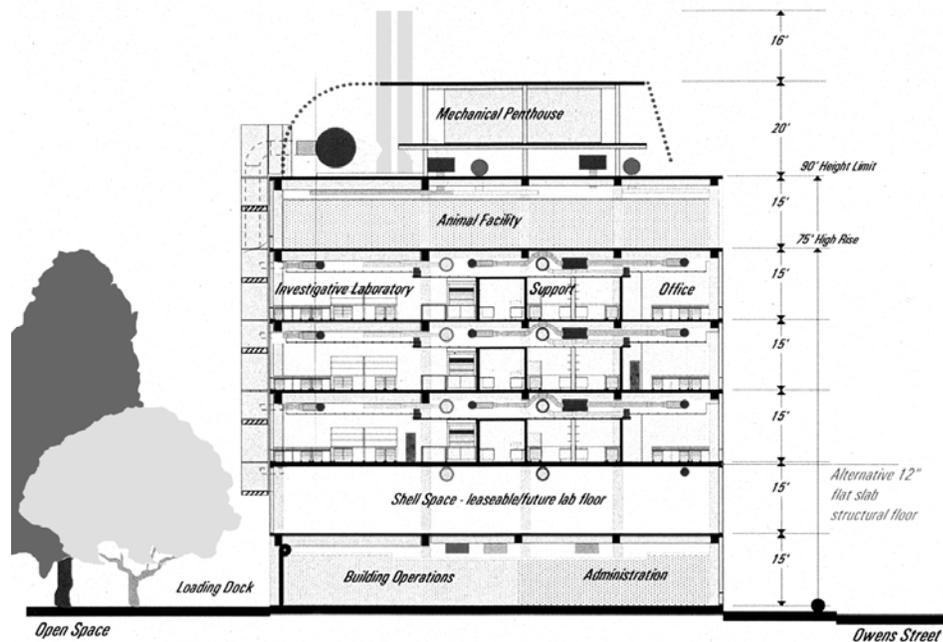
Floor-by-Floor Schematic of Gladstone (image by NBBJ, from Oshiro 2005)
